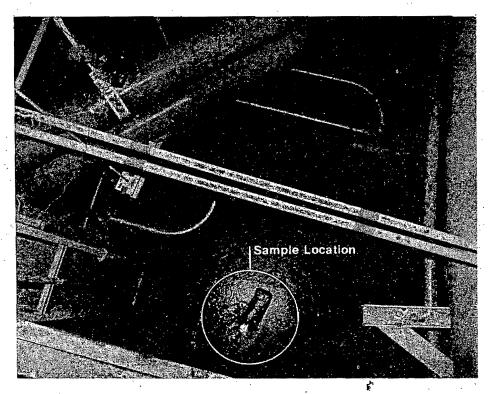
Basement floor one level below 305-foot elevation after sample was taken.
